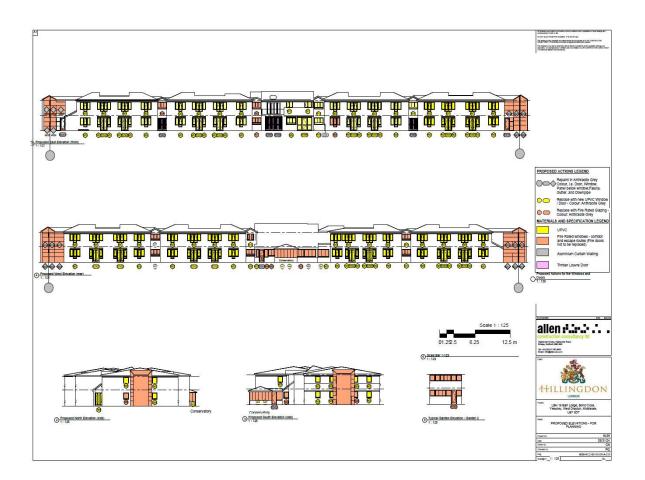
Proposed Elevations (please note – larger version of plan can be found in the Committee Plan Pack)
